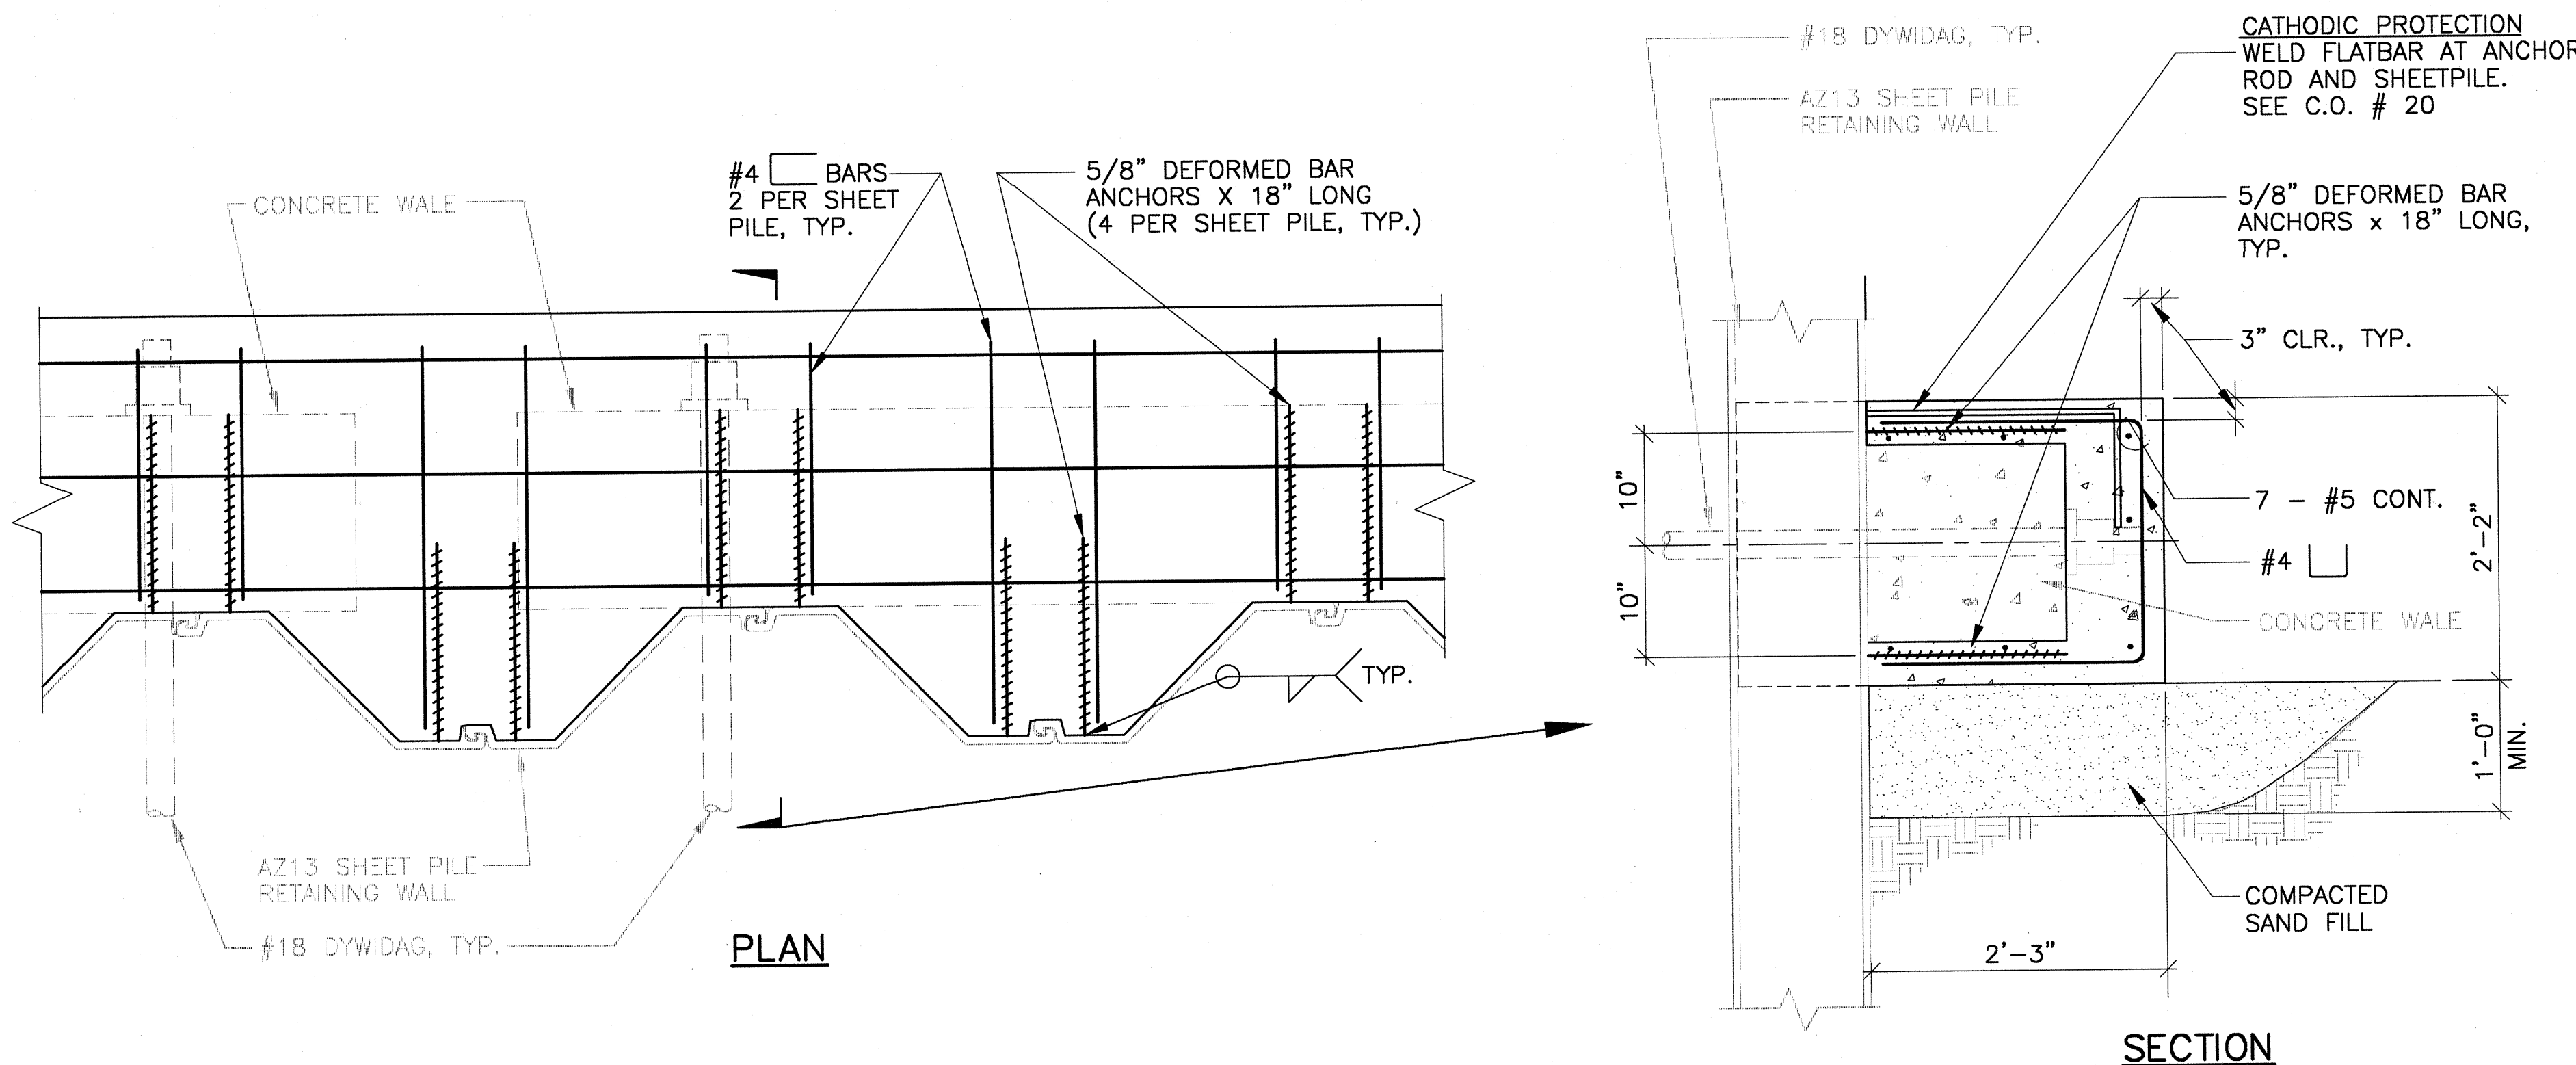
DETAIL (WEST ANCHOR WALL TO WEST END WALL ONLY)
